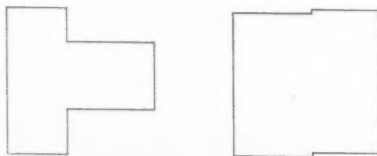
, two plans with the same wall area (a) has 268 sq. yds. of external walling, (b) 240 sq. yds.
